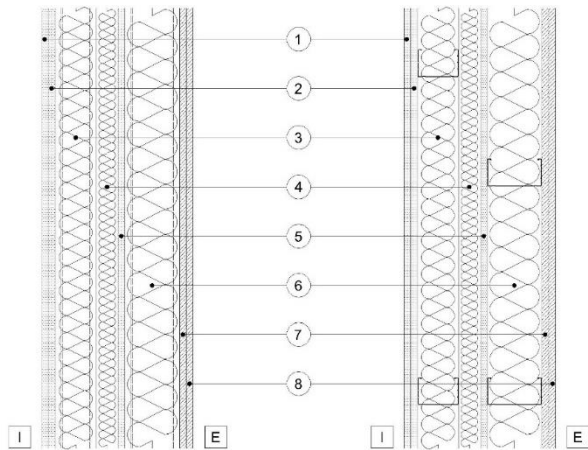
Exterior wall construction: vertical section on the left, horizontal section on the right
